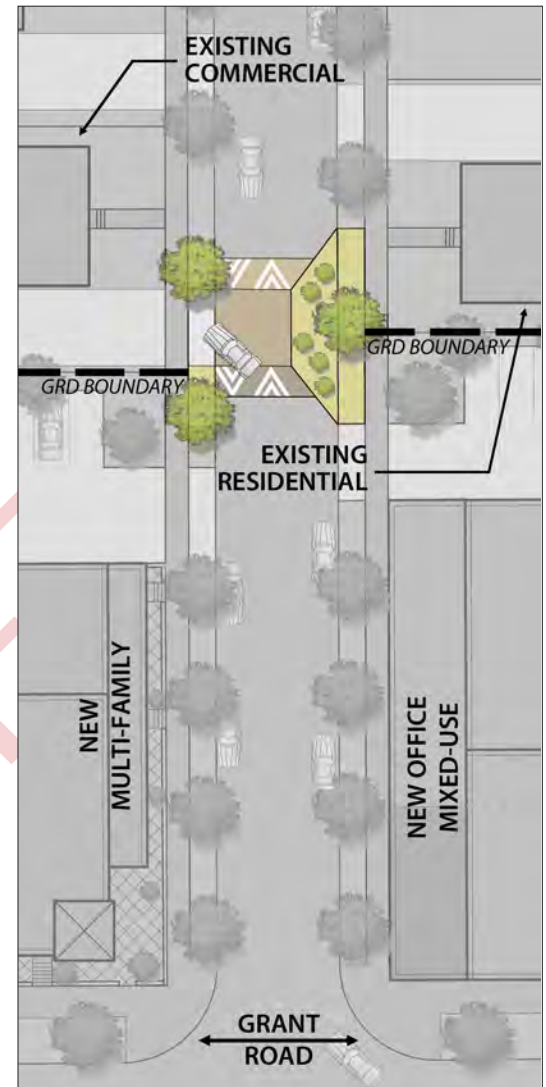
c: Diagram of a chicane and speed table at driveway where location restrictions exist.
